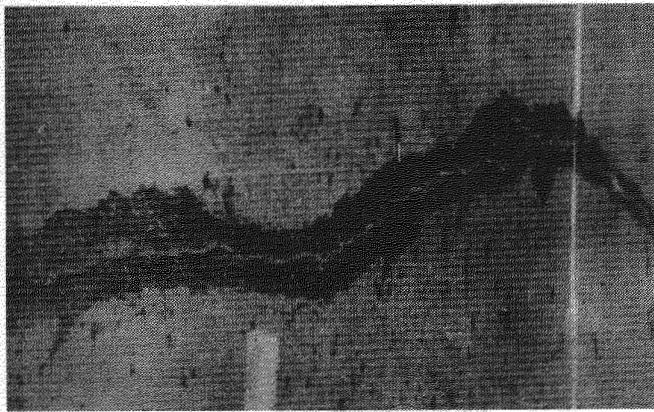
A Photo Showing a Crosswise Crack Running Through the Cross-section of the Highway
